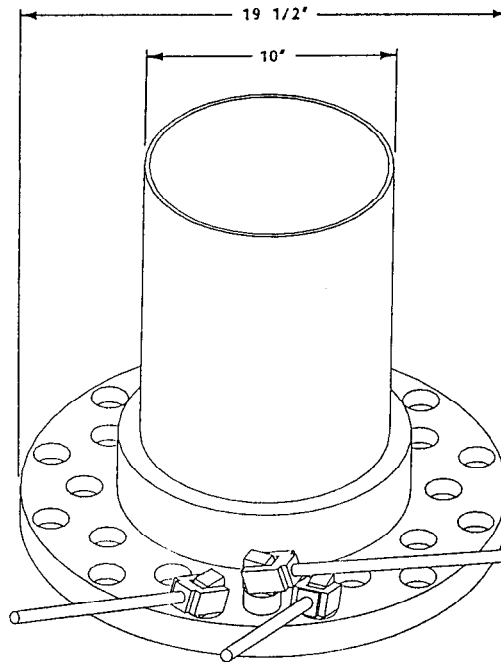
Diagram of Hub Flange with Inner Spoke End Connection Details Shown.
